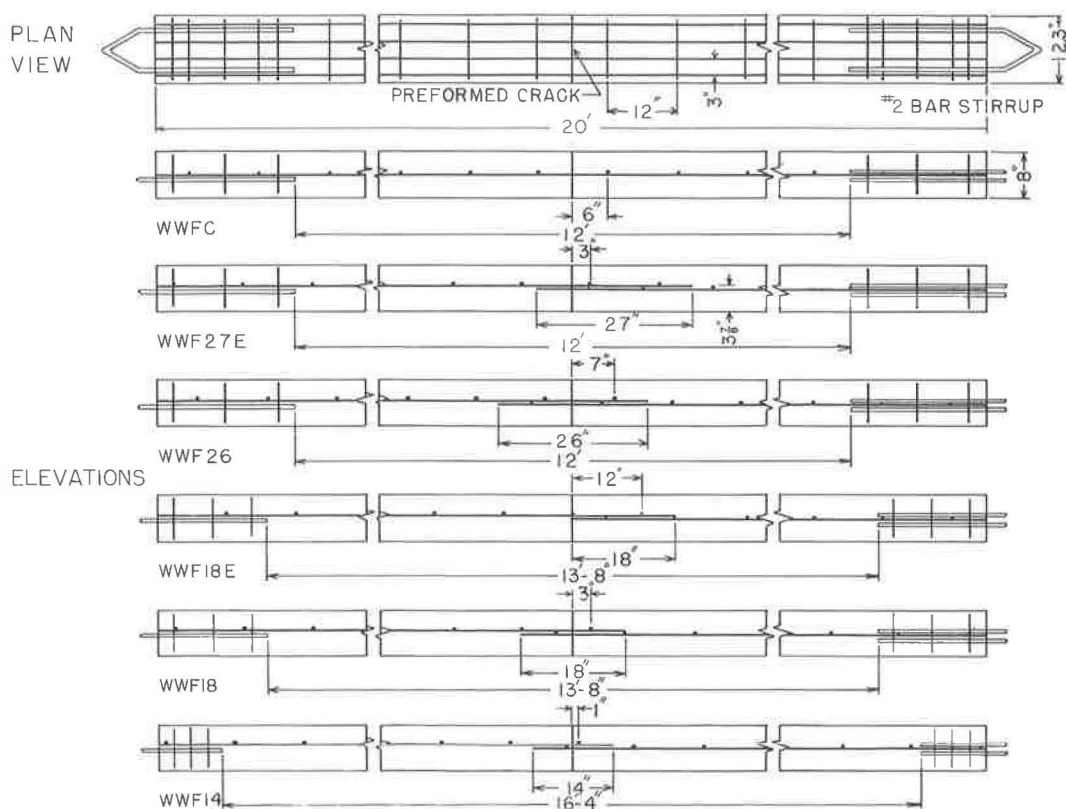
Welded-wire fabric specimens, series WWF.
